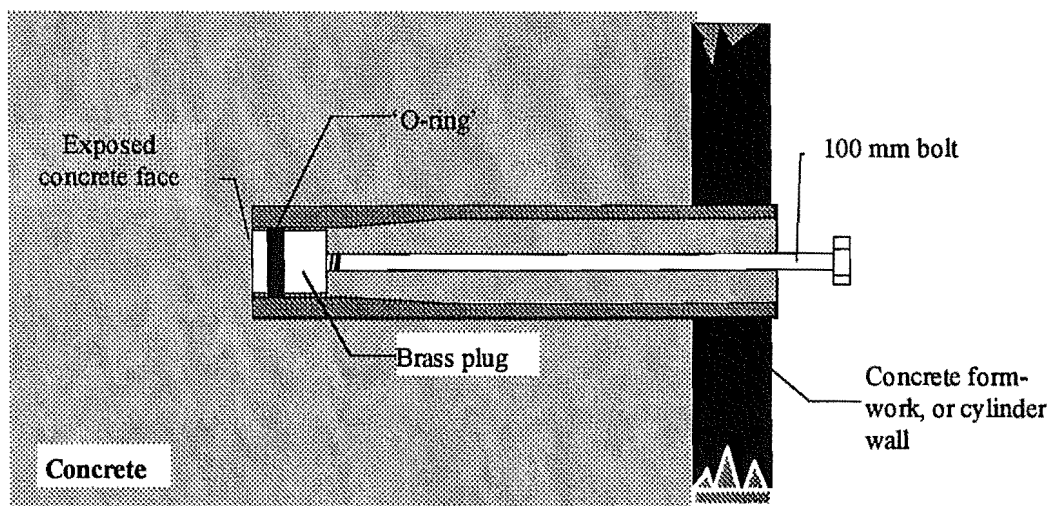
Brass plug inserted in relative-humidity probe housing. The bolt is used to insert or withdraw the plug.
